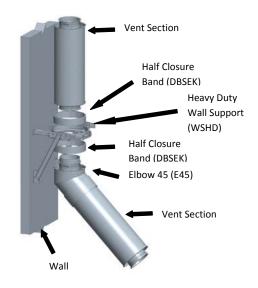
Elbow with Heavy Duty Wall Support (WSHD)
